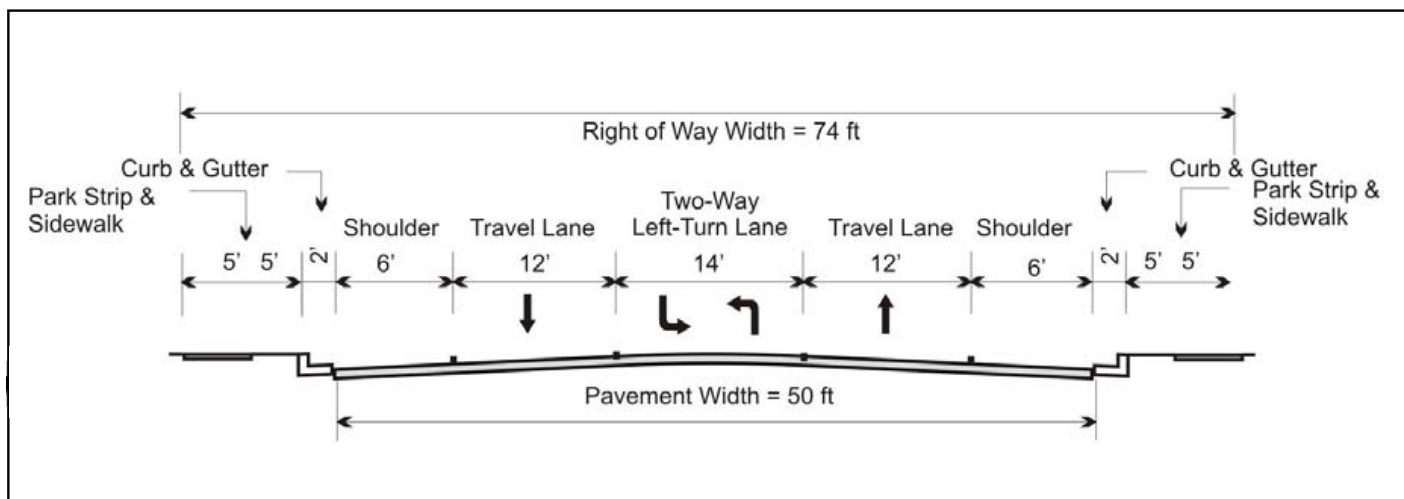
Three-lane Major Collector Street Cross-section, Between Intersections
